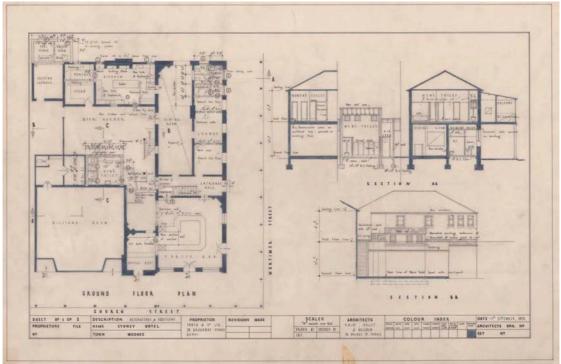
Ground Floor Plan and Sections of the Sydney Hotel, 1956.
